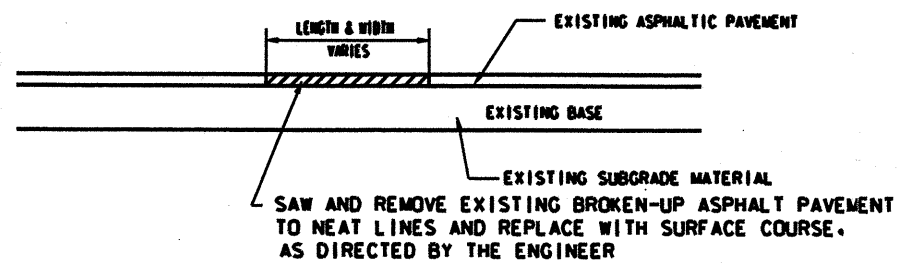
DETAILS OF REPAIRING EXISTING PAVEMENT PRIOR TO RESURFACING FOR FULL DEPTH AND MILLING
